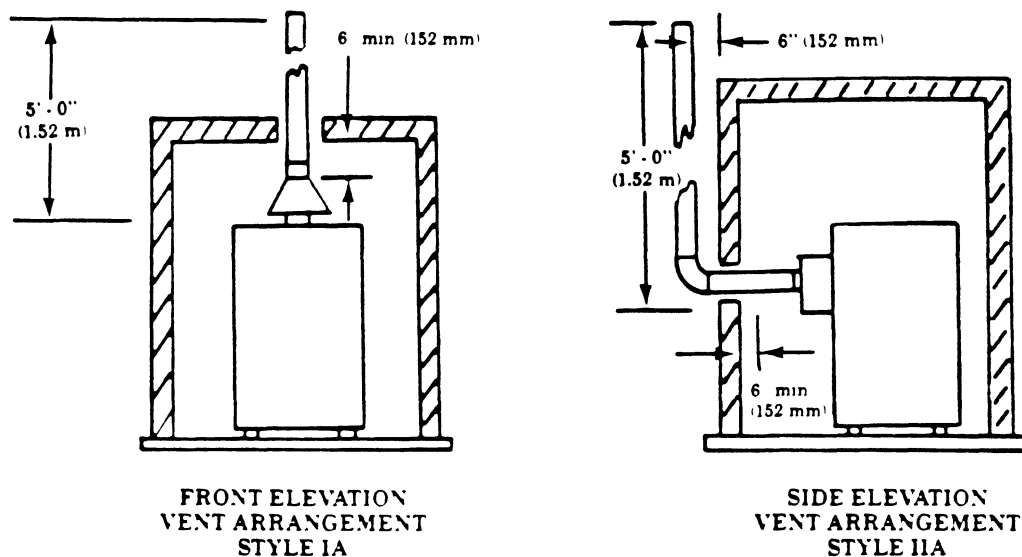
Alternate Vent Arrangement for Wall, Floor and Ceiling Temperature Tests
